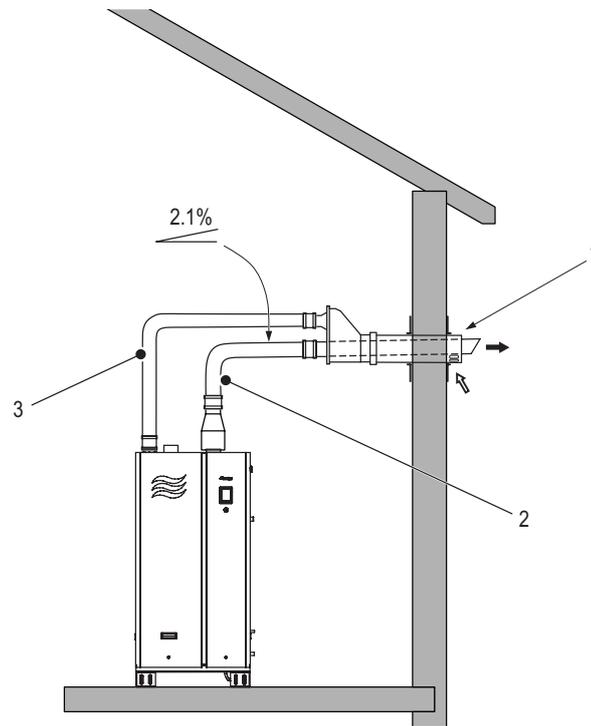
Type C13 Exhaust Venting for Room Seal Installations
